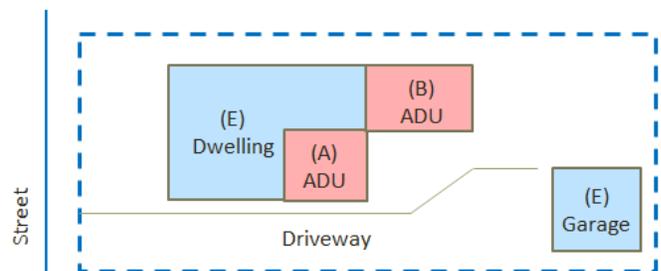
ADU within existing dwelling (A) or new & attached to dwelling (B).
